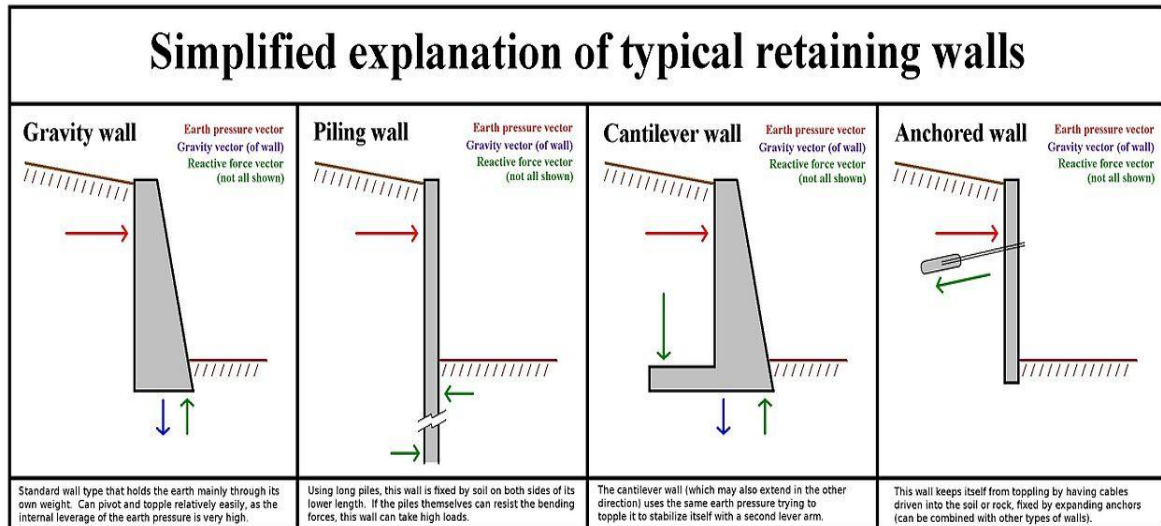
Typical Butters retaining walls (<http://www.aboutcivil.org/retaining-wall-definition-types-uses-retaining-walls.html>).
